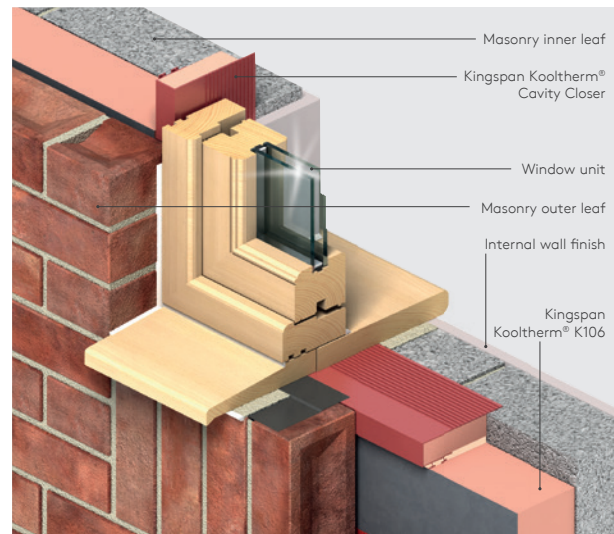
Kingspan Kooltherm® Cavity Closer in a Masonry Cavity Wall Construction with Kingspan Kooltherm® K106 Cavity Board
